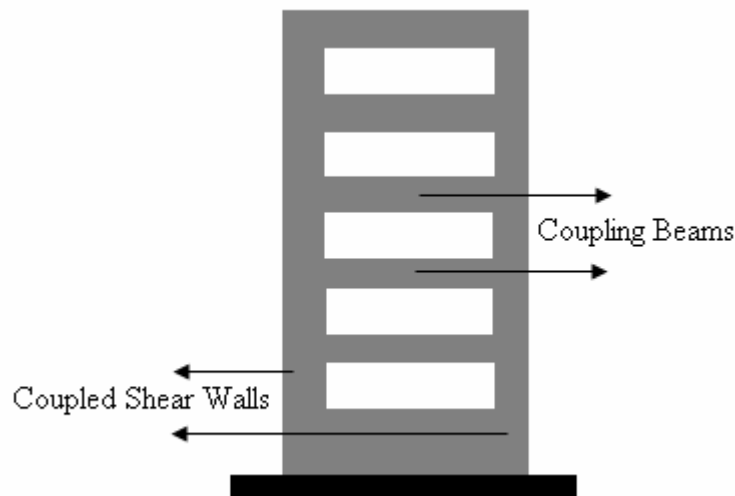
1. A Shear Wall System with Coupled Shear Walls and Coupling Beams
